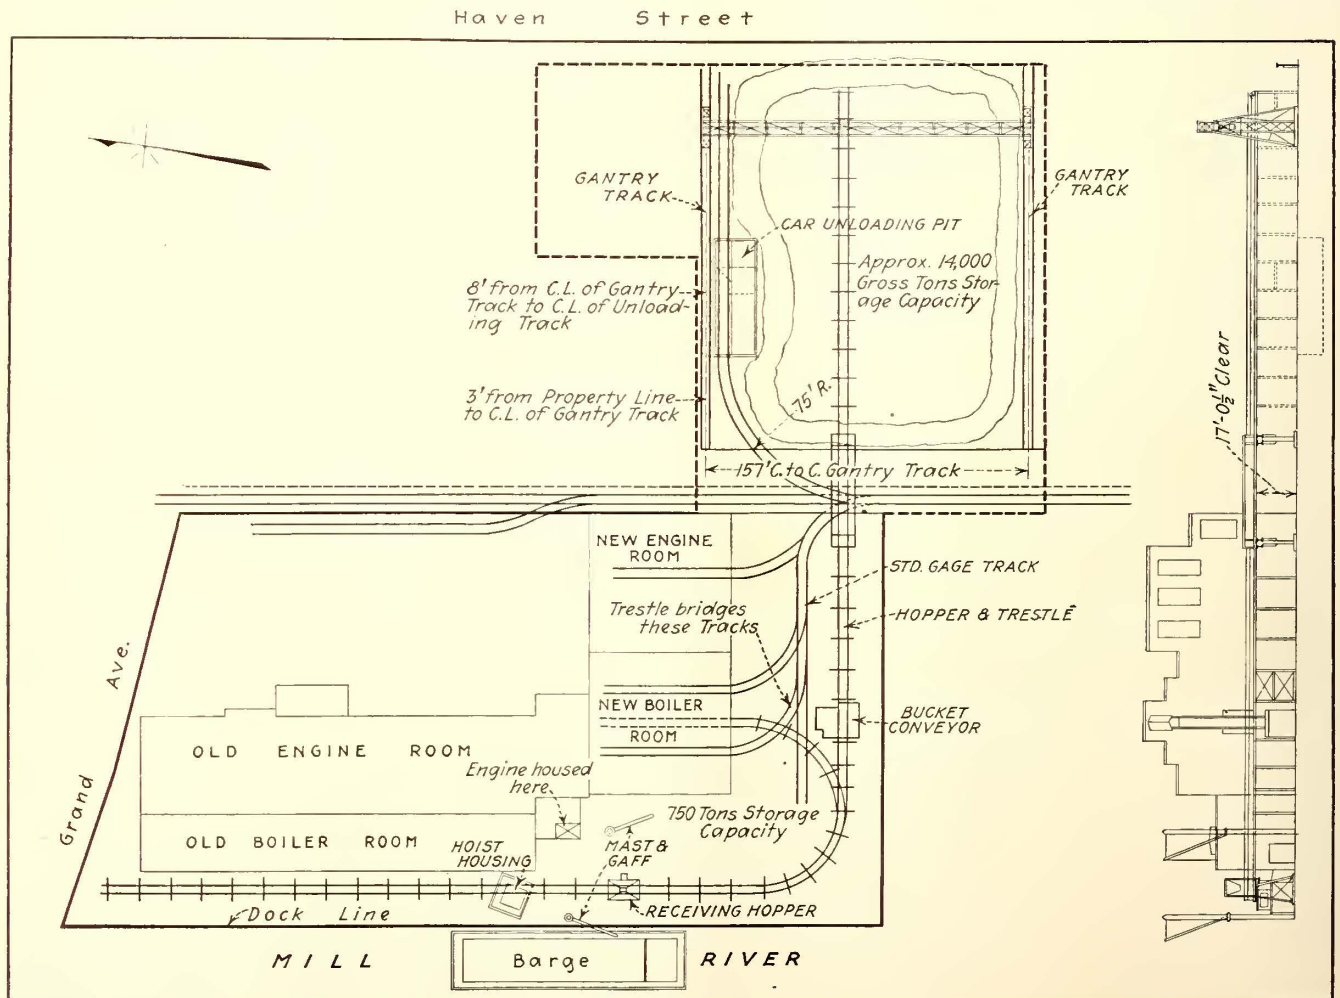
GENERAL LAYOUT OF COAL HANDLING EQUIPMENT AND STORAGE FACILITIES AT NEW HAVEN, CONN.
